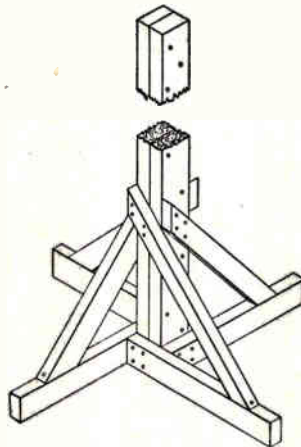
This shows one way to build a sturdy wooden mast for temporary outdoor installations. Be sure to use 2 x 4 timbers. A height of 12 or 14 feet is about the maximum that is practical.
